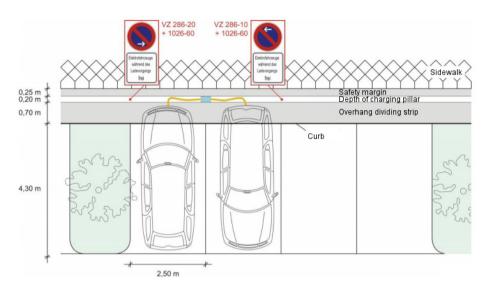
Site layout for bay parking given in [663] (translated)
